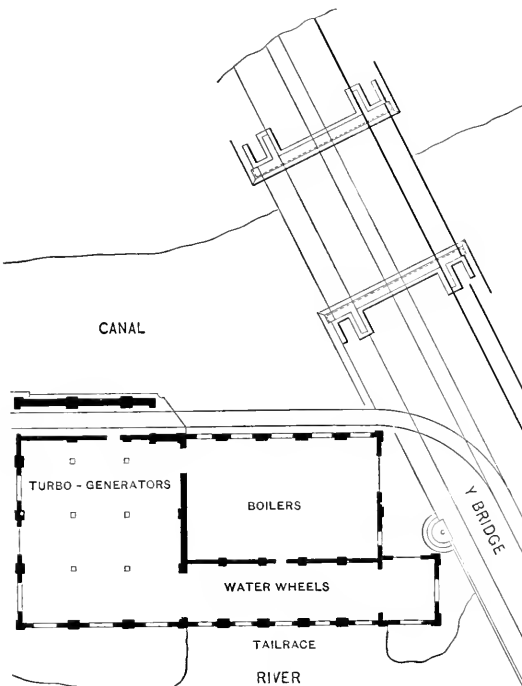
PLAN OF POWER HOUSE, ETC.
